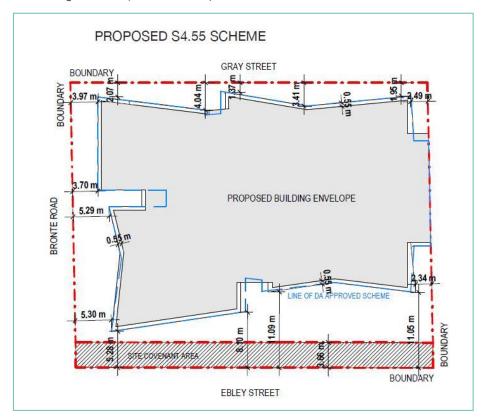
Proposed building setbacks (S4.55 Scheme)
